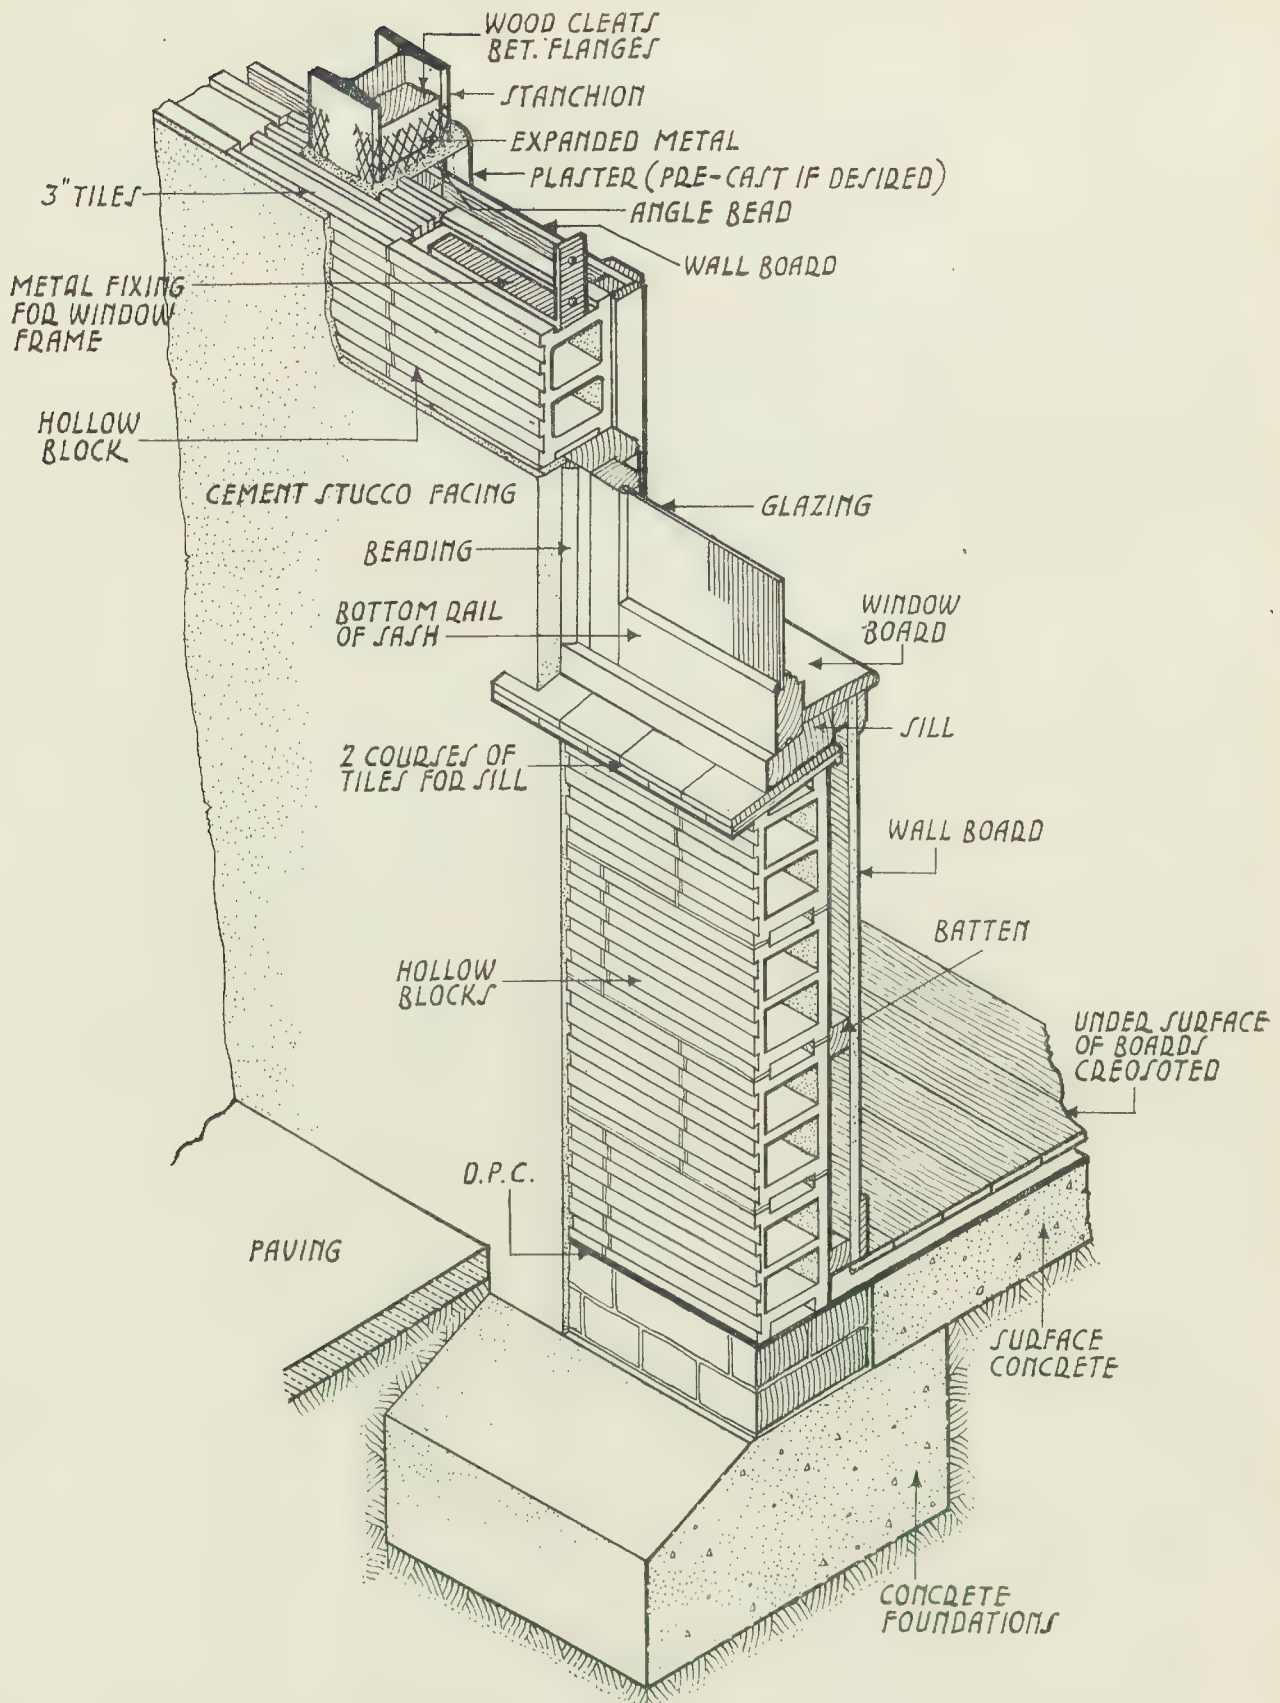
CONSTRUCTION AT BASE OF EXTERNAL WALL BUILT WITH HOLLOW BLOCKS
